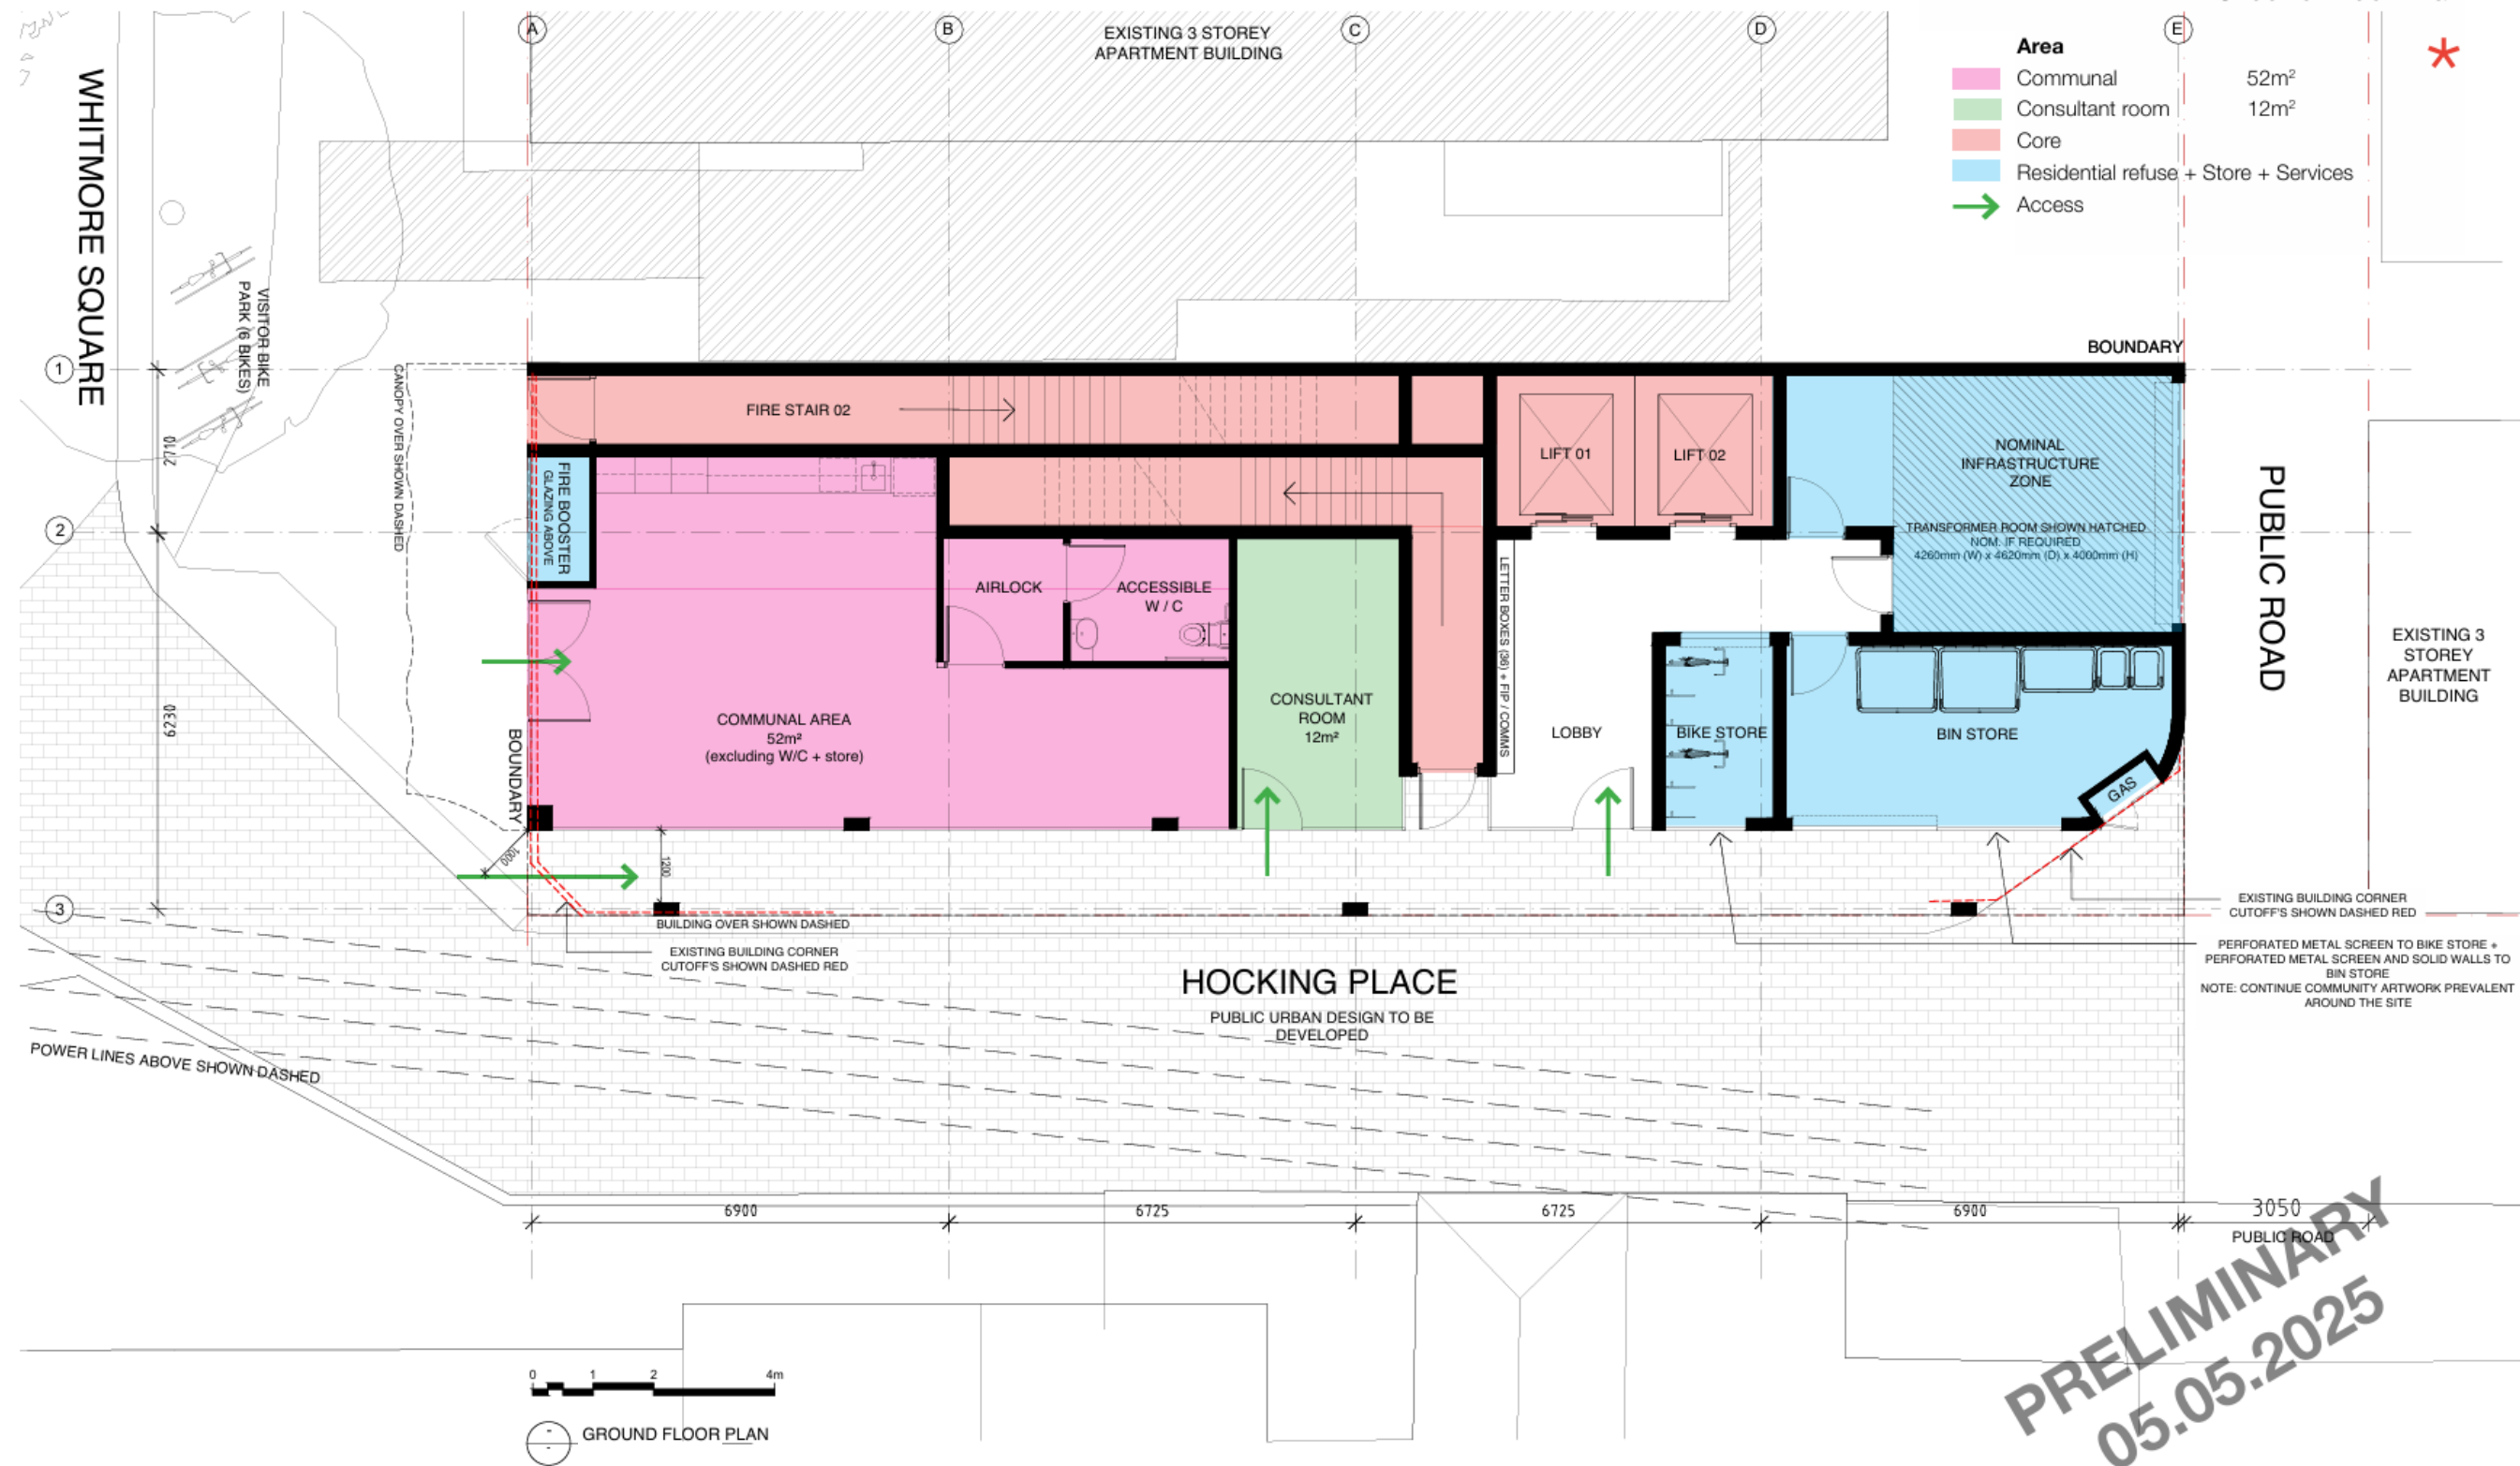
Ground floor site plan for the Development. Ground level plan reproduced from concept plans by the Architect (Tectvs Architecture, May 2025).
